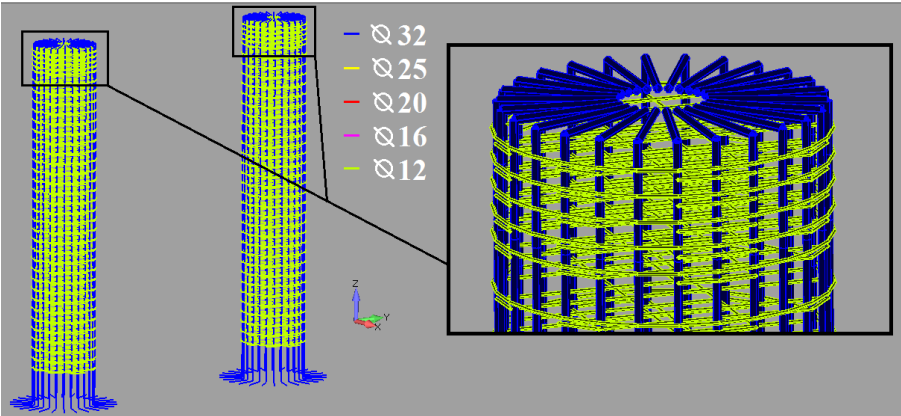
RC Bridge. Embedded rebar mesh of the Pylons (4,432 embedded rebar macro-elements).
